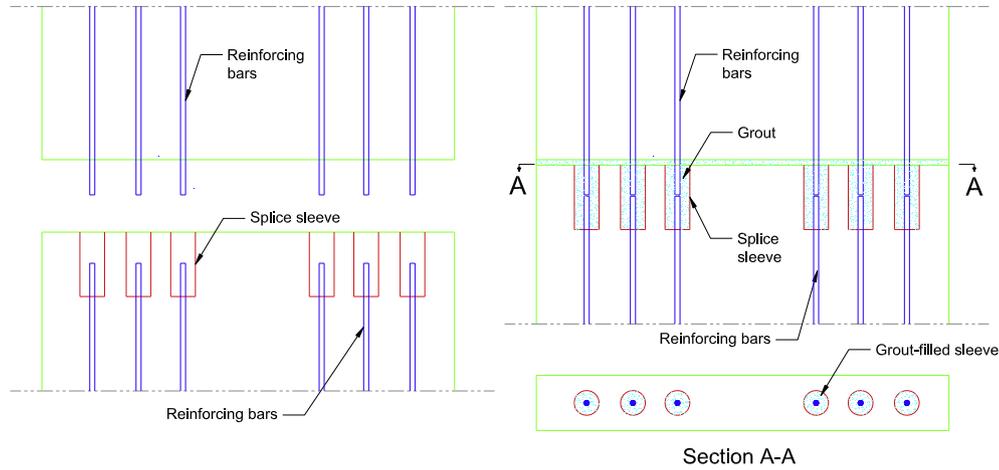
Two precast concrete components before (left) and after (right) connecting using bar splice sleeves.
